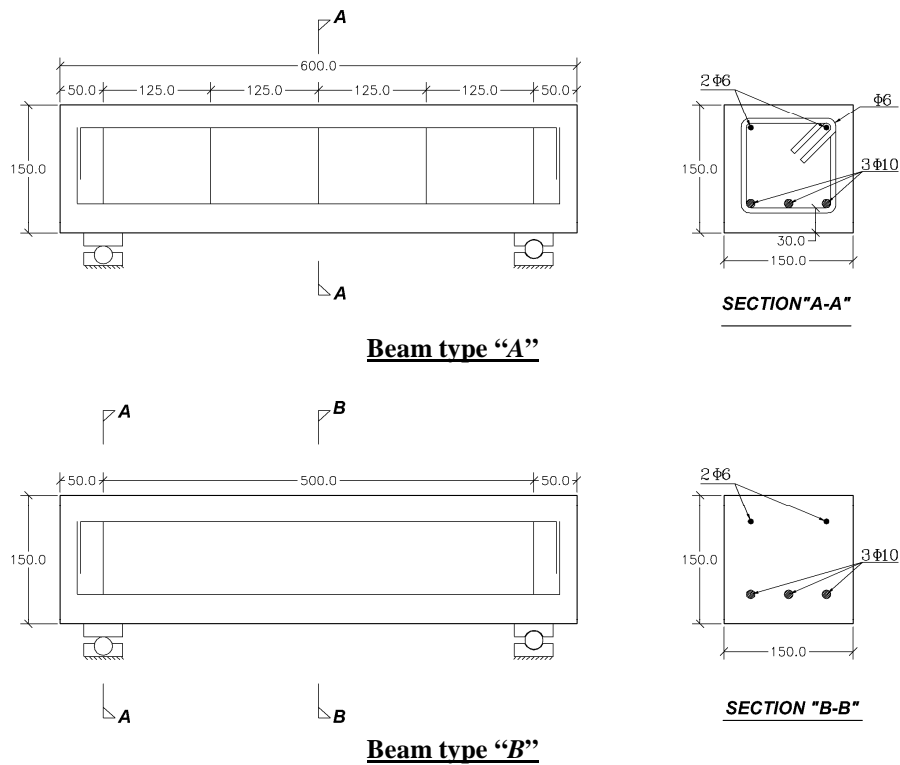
Geometry and reinforcement arrangements of concrete beams of the experimental program (dimensions in mm)
